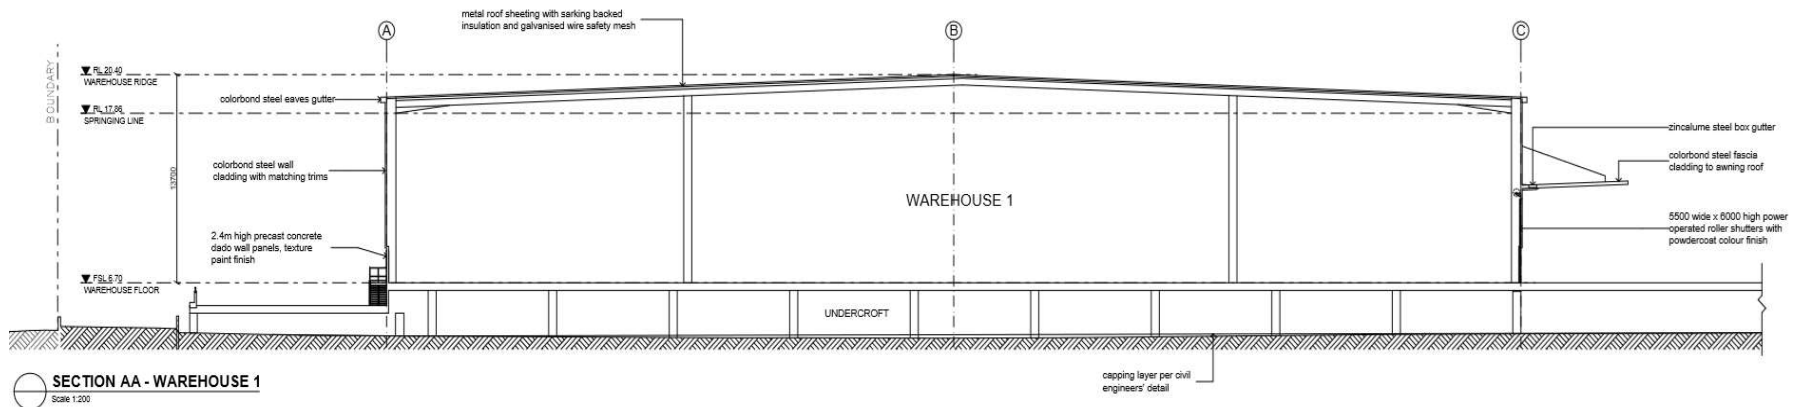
Cross-section of Warehouse Building 1 (Source: Axis Architectural)
